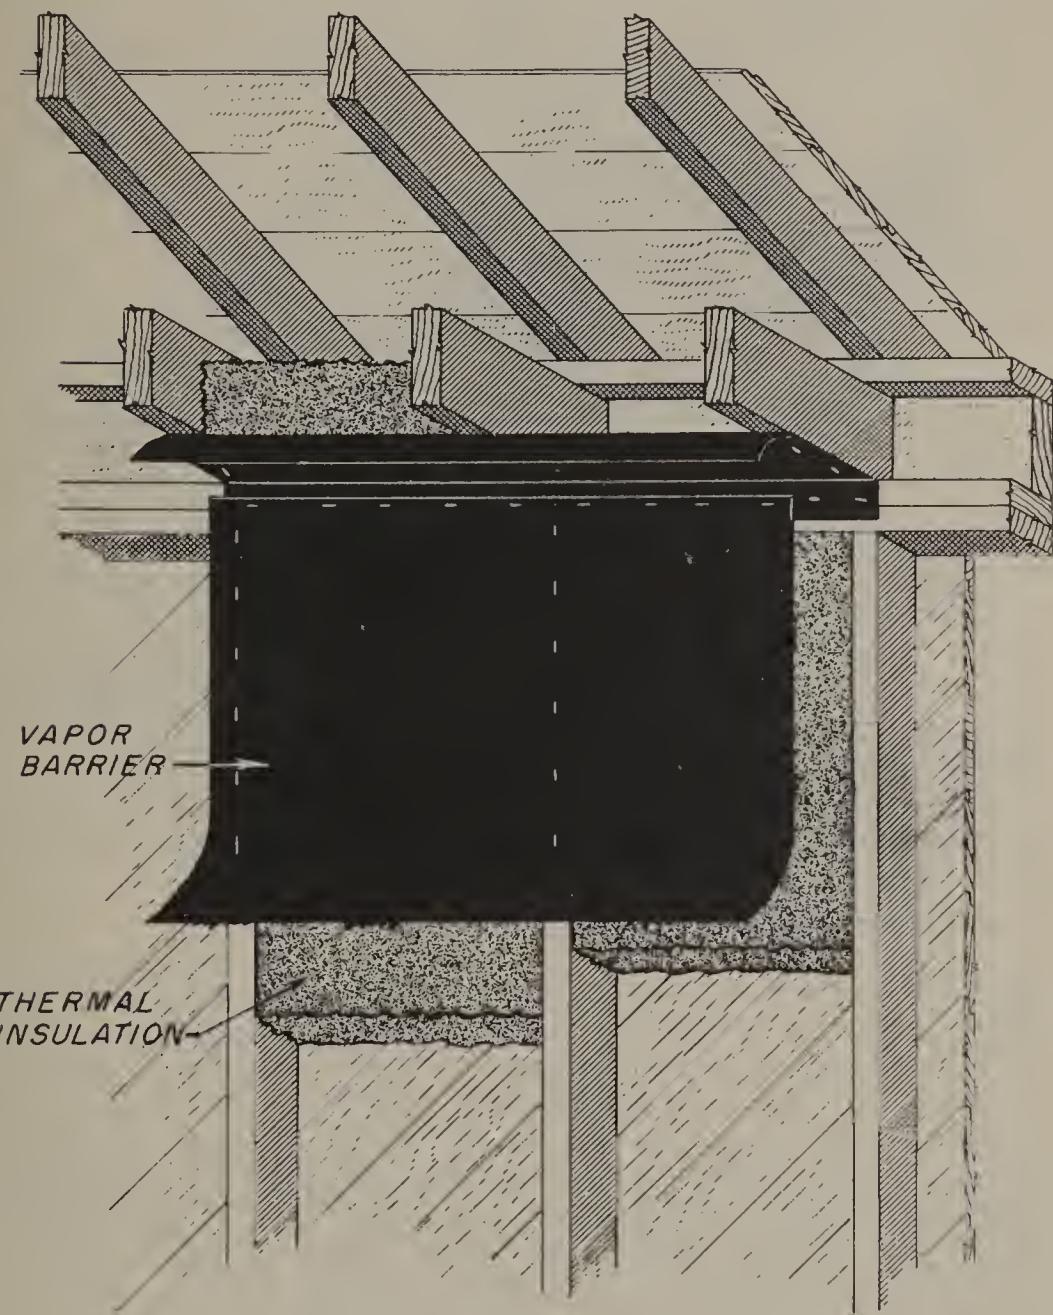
Junction of attic floor, roof, and side wall.* Condensation control is obtained by the use of a vapor barrier over the face of the studs and lower side of the attic floor joists making a lap on the side wall plate. The thermal insulation is fill- or batt-type material without a vapor barrier.
